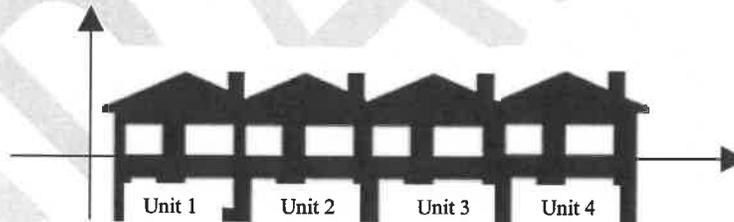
G: Linear Multi-Family Dwelling Arrangement
